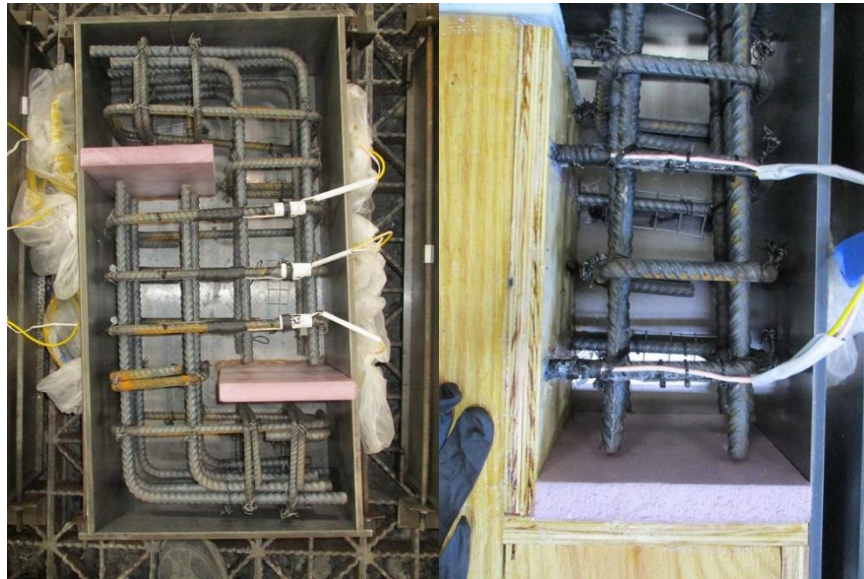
Several designs for reinforcing steel for shear pushoff testing. Connection of surface mounted strain gages and fiber optic gages.
